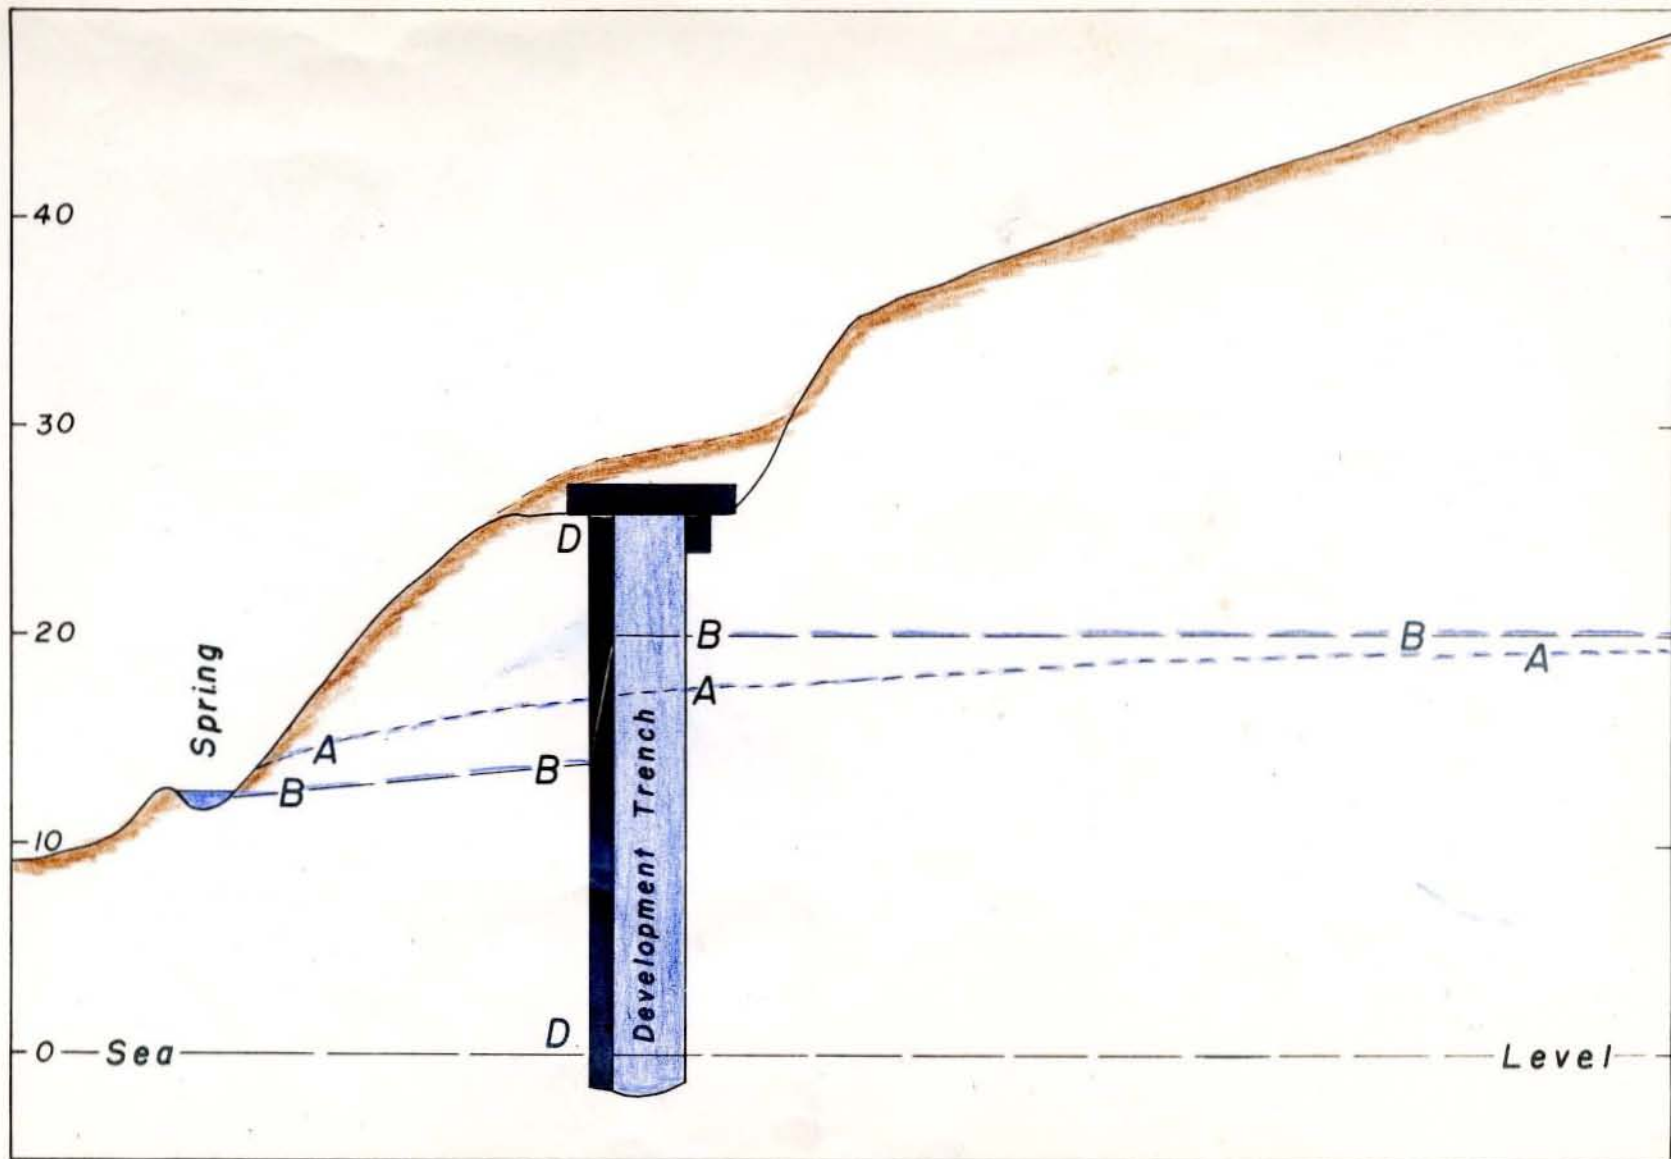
Ideal section showing ground water conditions before and after construction of cut-off wall and development trench. Water table before construction, AAA; after construction, BBBB.
